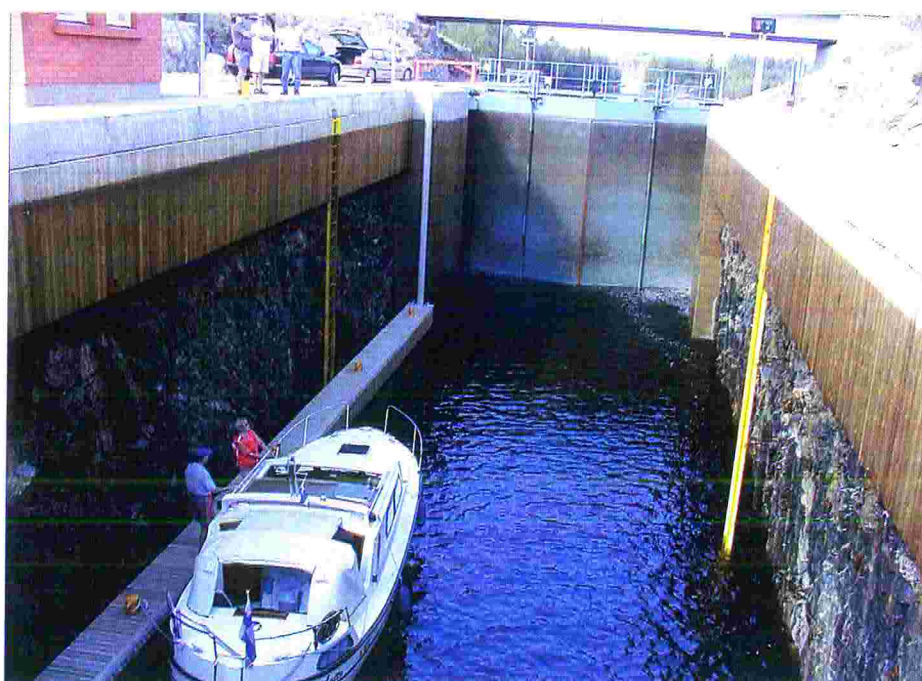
Karjalankoski*: the wooden wall and floating platform
